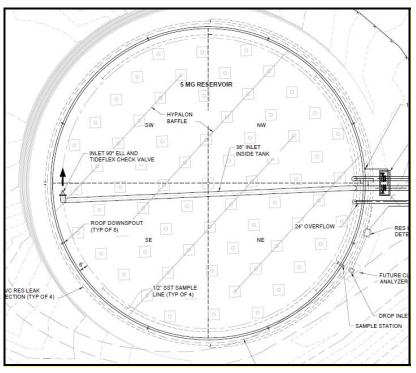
PRELIMINARY BAFFLE LAYOUT
